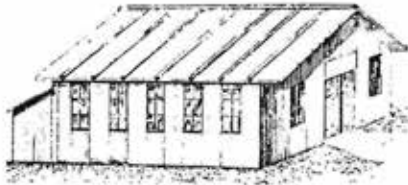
Prefabricated cardboard house, Adt, 1867
